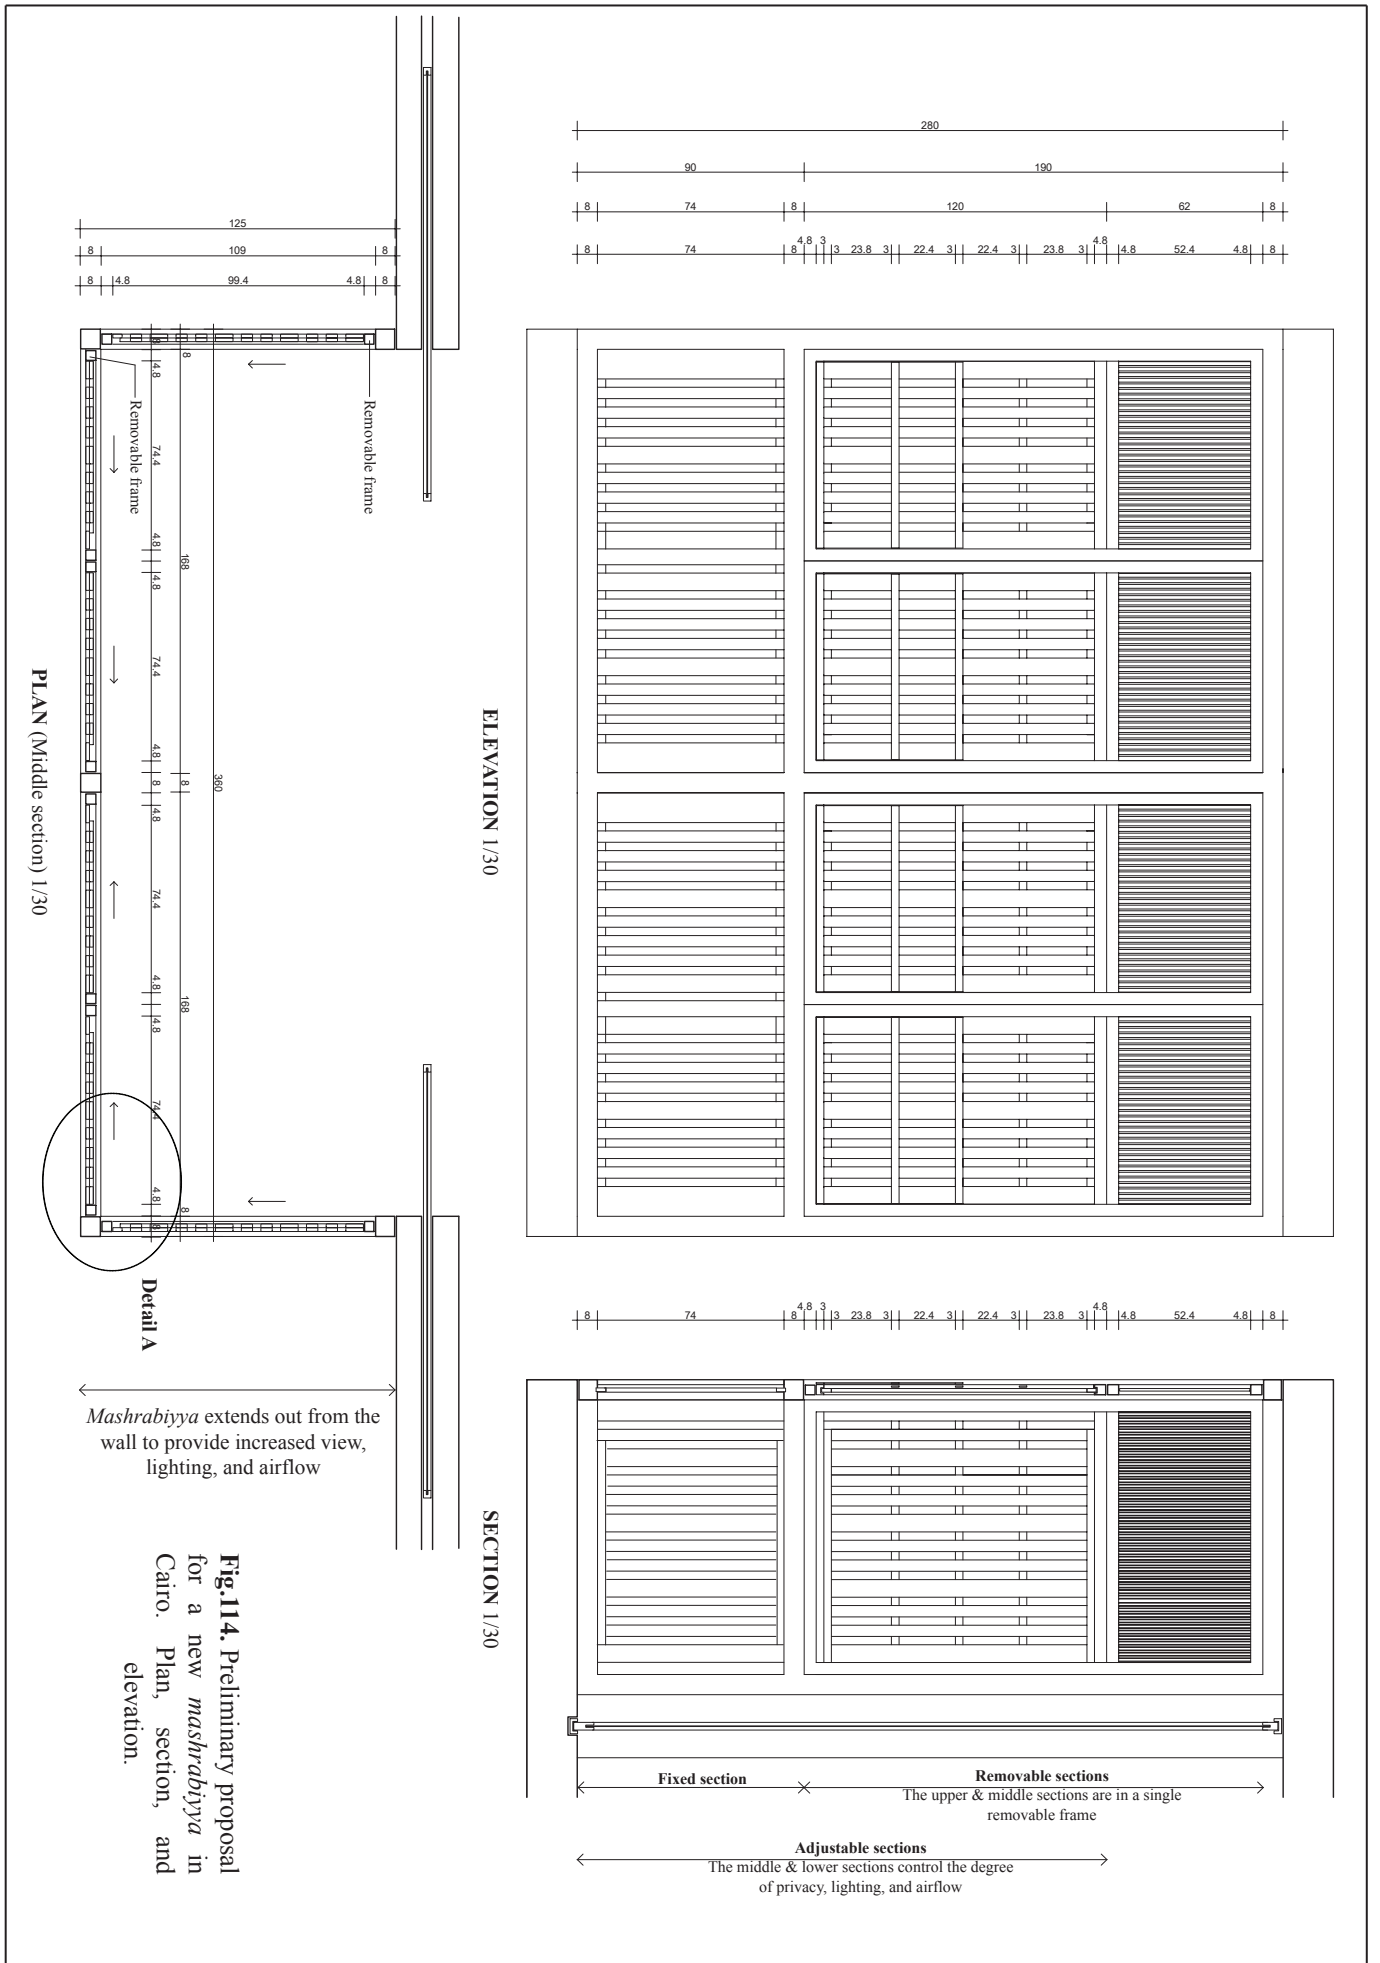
Preliminary proposal for a new *mashrabiyya* in Cairo. Plan, section, and elevation.
